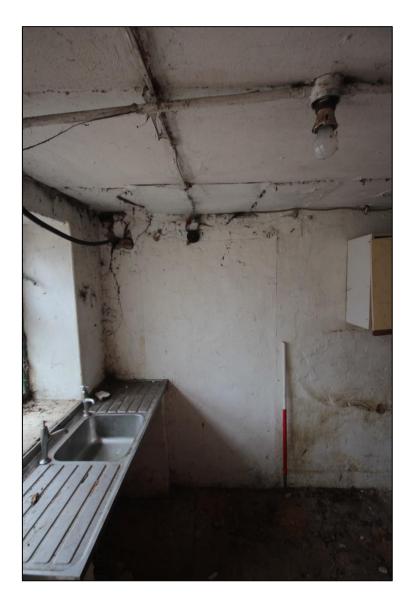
Blocked doorway on the north wall within the utility room, taken facing north-west with 1m scale.
